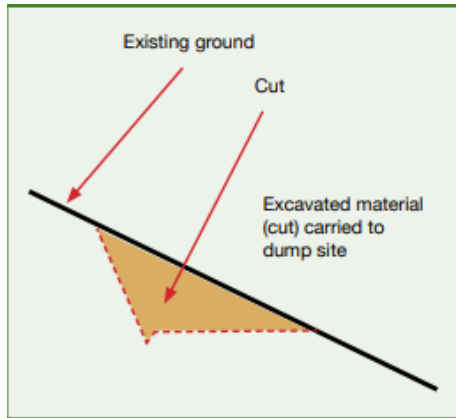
Full bench or end haul construction technique (FOA, 2020).
